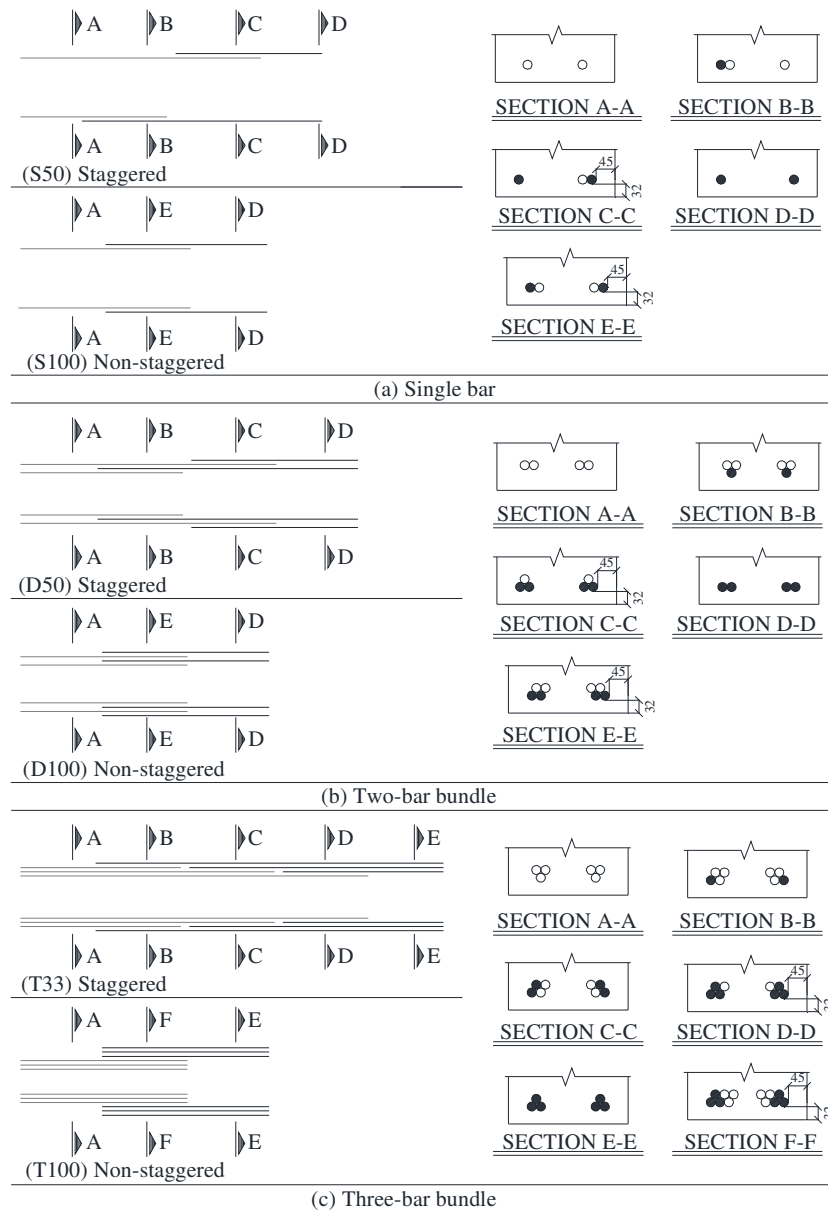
Arrangement of bars along the splice zone and location of strain gages (all dimensions are in mm)
